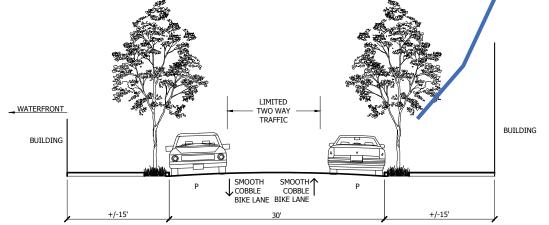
Possible Configuration for Beard Street between Conover Street and Erie Basin Park
